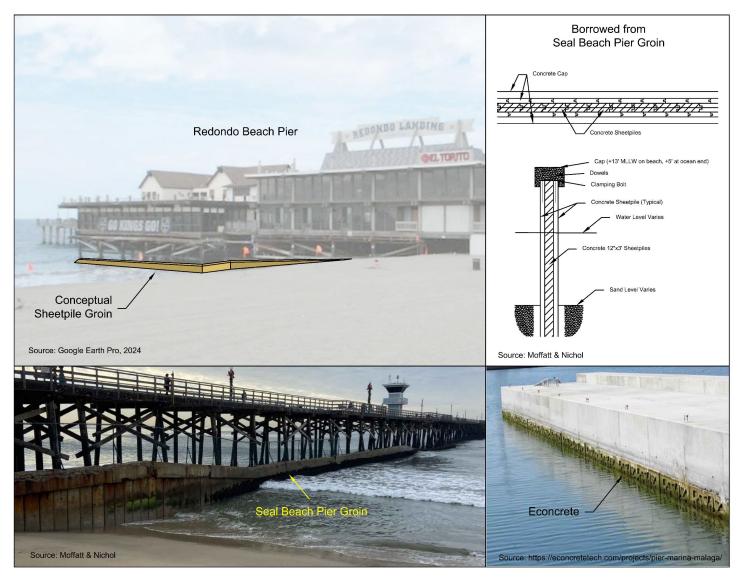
Conceptual Illustration of Proposed Sheet Pile Groin, Seal Beach Pier Groin, and ECOncrete Finish
